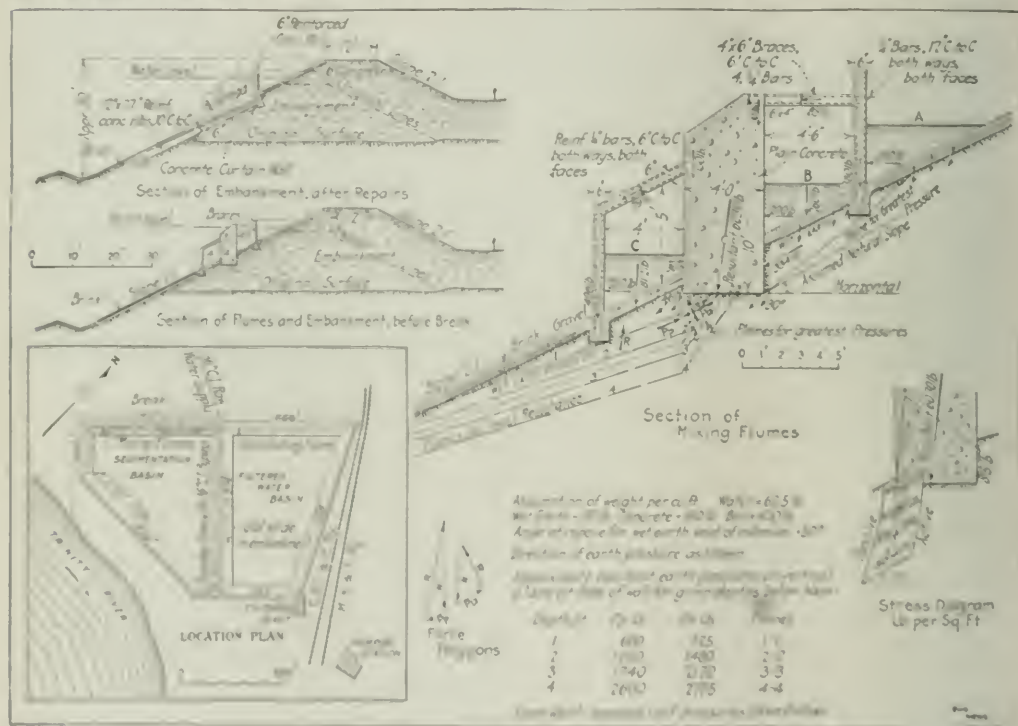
MIXING FLUMES FOR FILTRATION PLANT, DALLAS, TEX., WITH SECTIONS AND DIAGRAMS SHOWING CAUSE OF FAILURE AND WITH LOCATION PLAN
